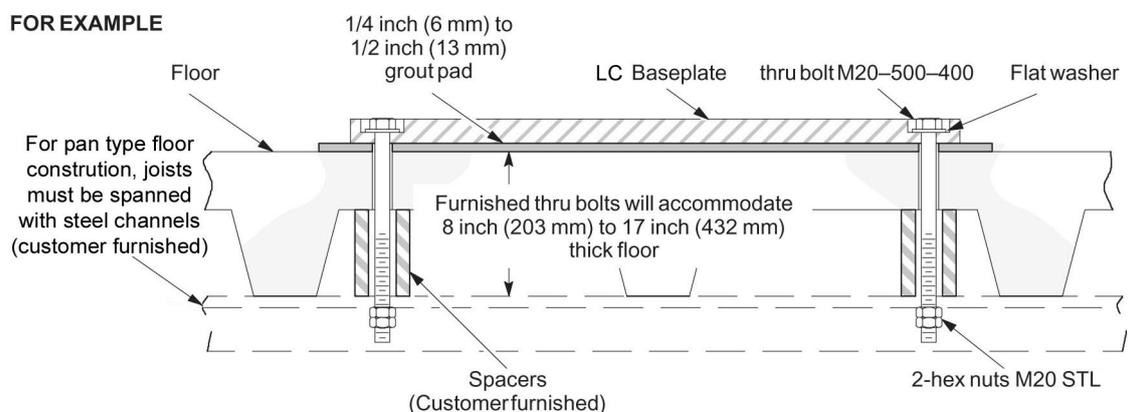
Through-Bolt Supplied (Pan Type Floor Construction)
